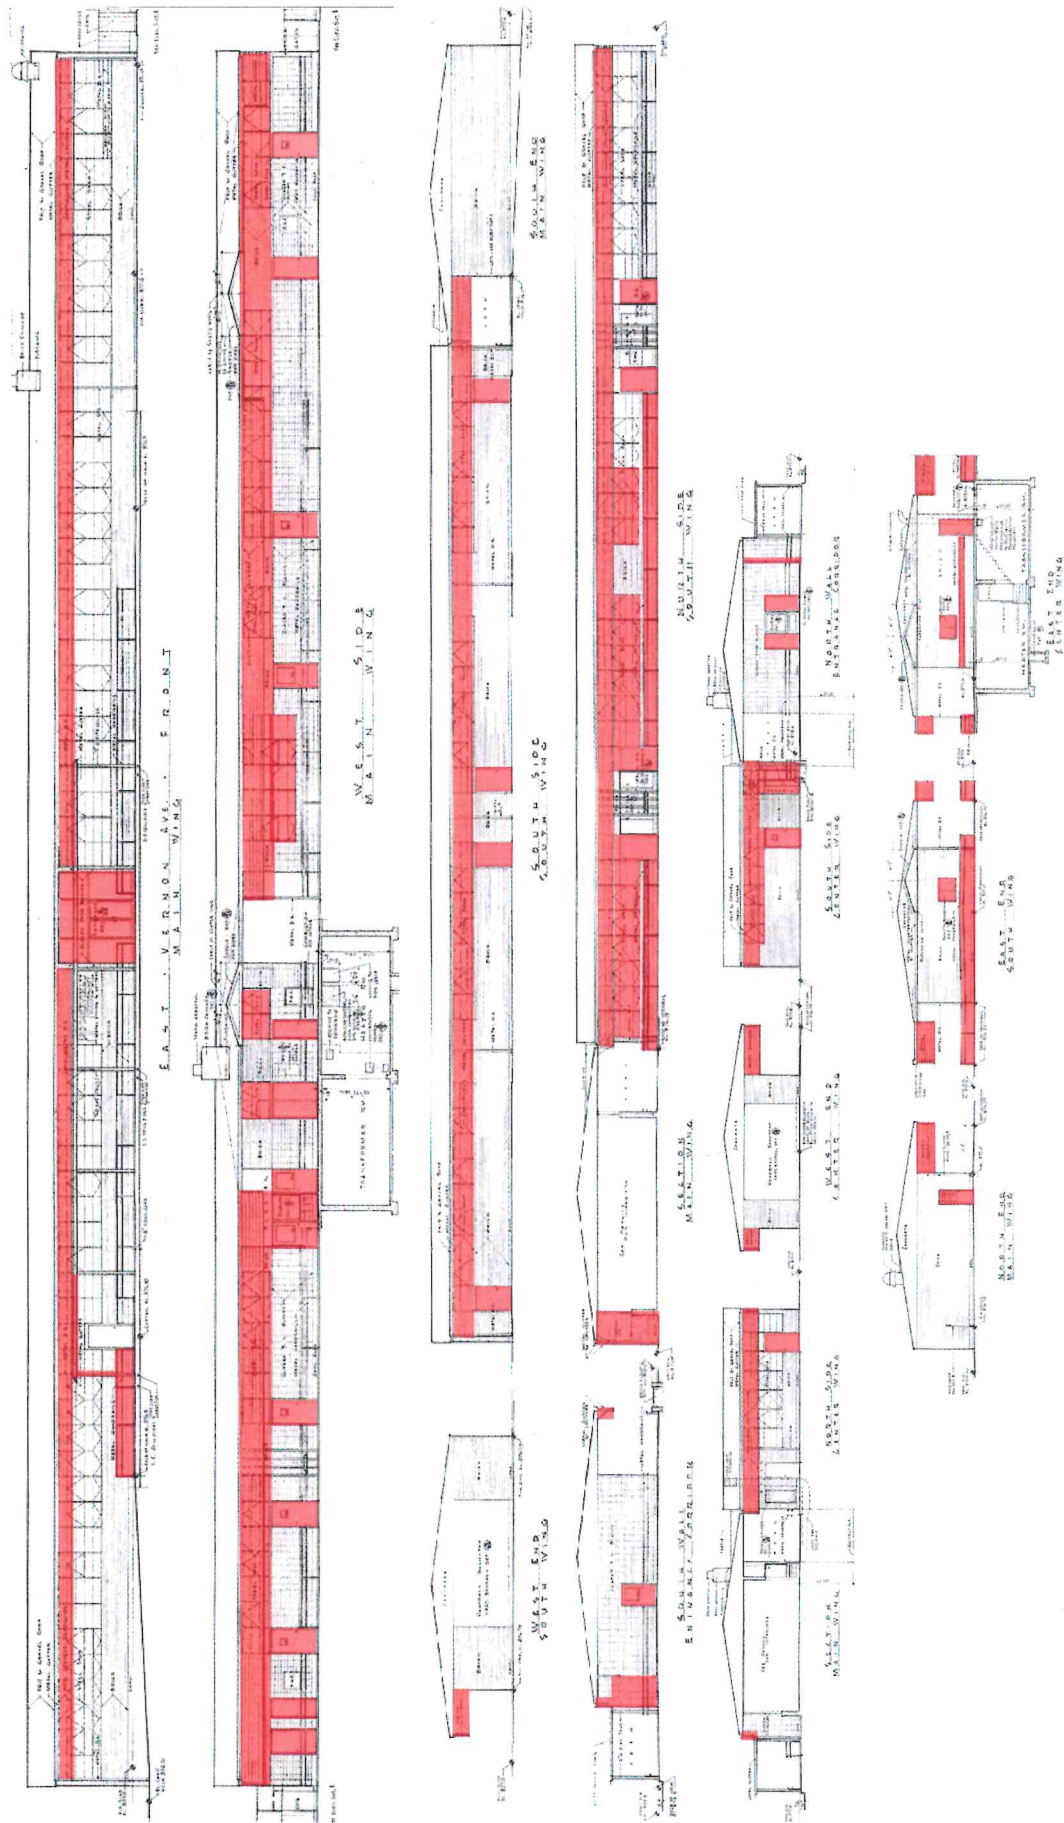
ROOSEVELT SCHOOL – 1953 EXTERIOR BUILDING ELEVATIONS ILLUSTRATING REMOVAL OF ORIGINAL EXTERIOR ELEMENTS (IN RED)
